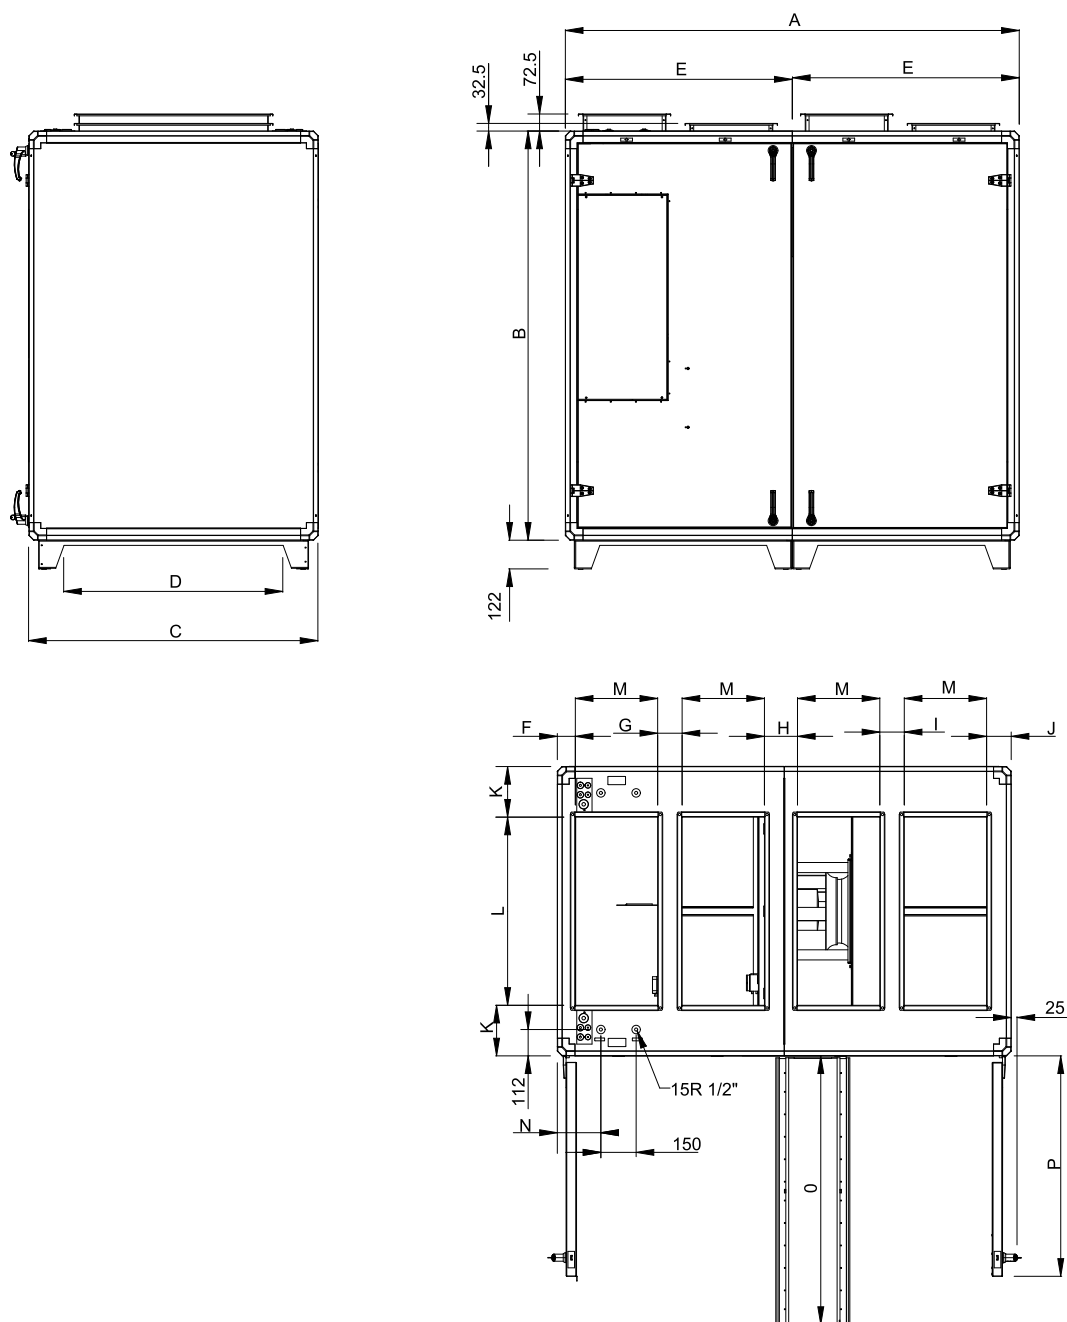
Dimensions (mm) Topvex TR 09-15 (Drawn as left hand unit)
